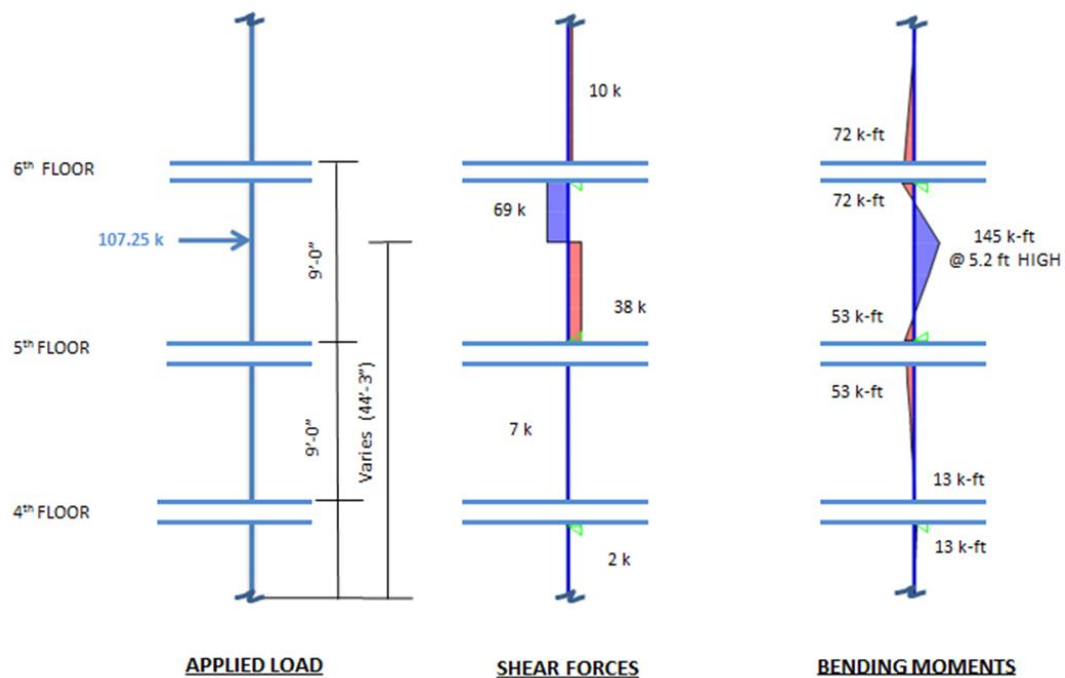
Impact load applied at "d + h_c" away from the end of column on the 5th floor
